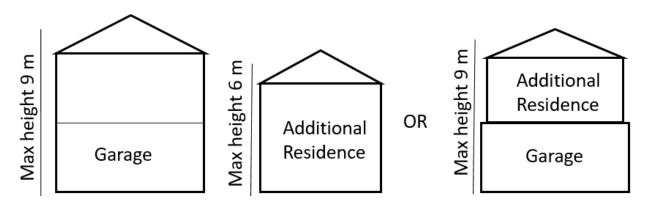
Garage and additional residence in two buildings or combined in one building (this proposal)
